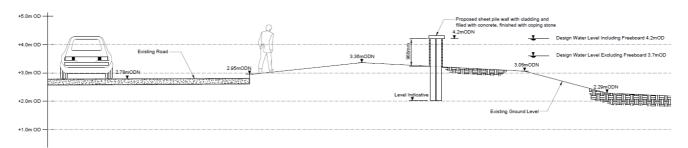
Typical Cross Section of Sheet Piled Solution with Cladding
